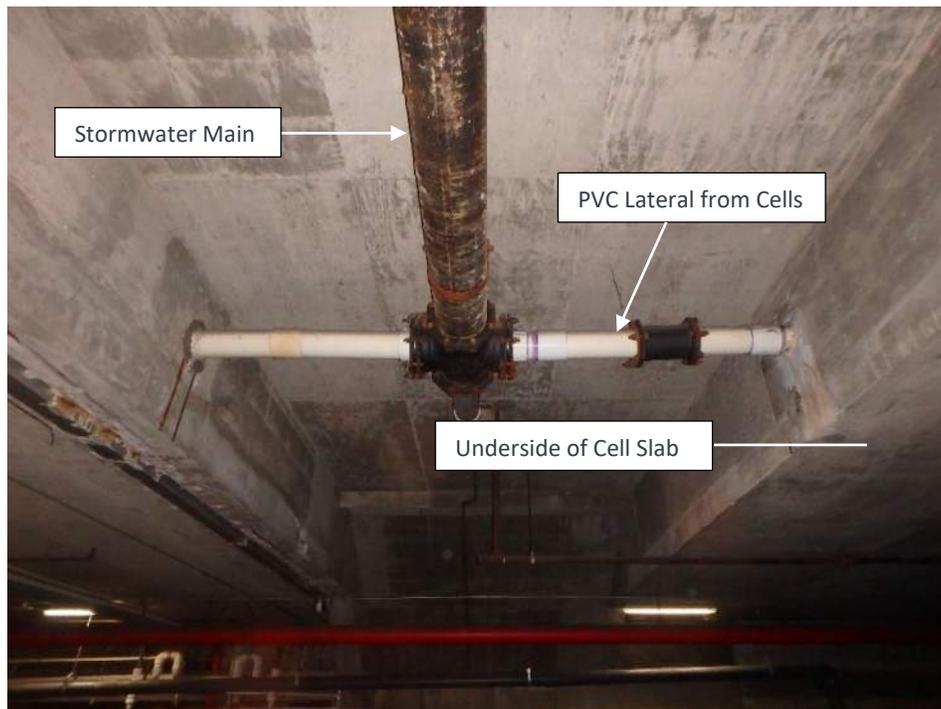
Typical cast iron east/west oriented stormwater main below Plaza Level
